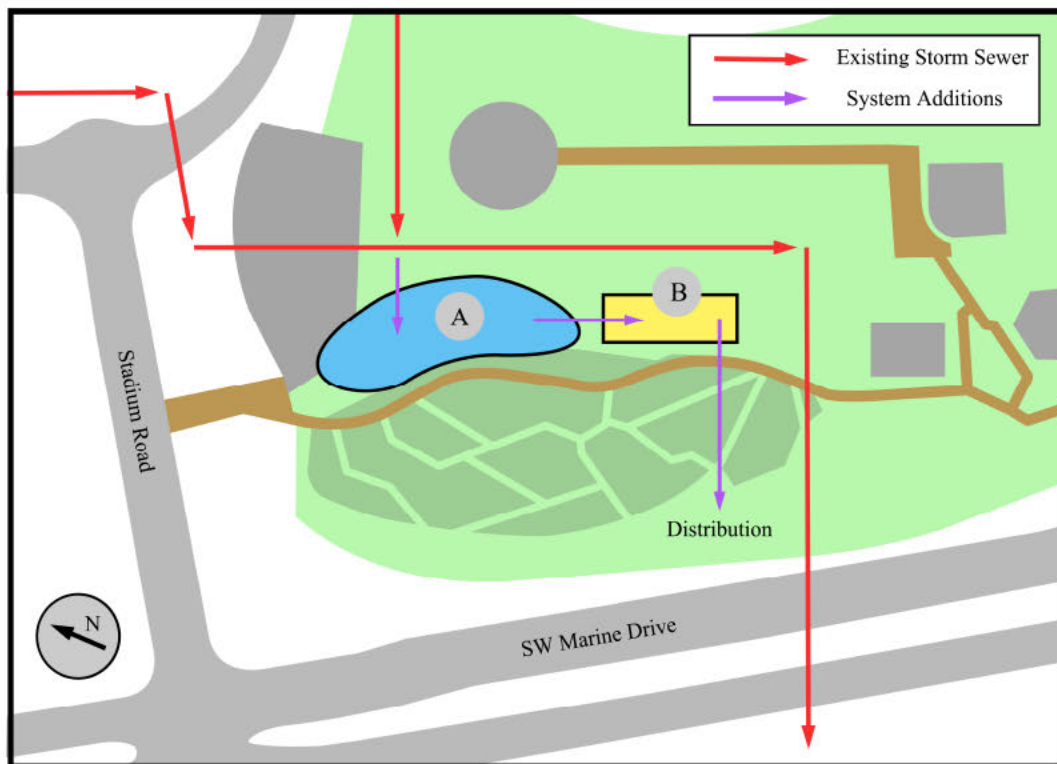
Simplified aerial system layout. Stormwater retention pond (A) and reed bed filtration system (B).
